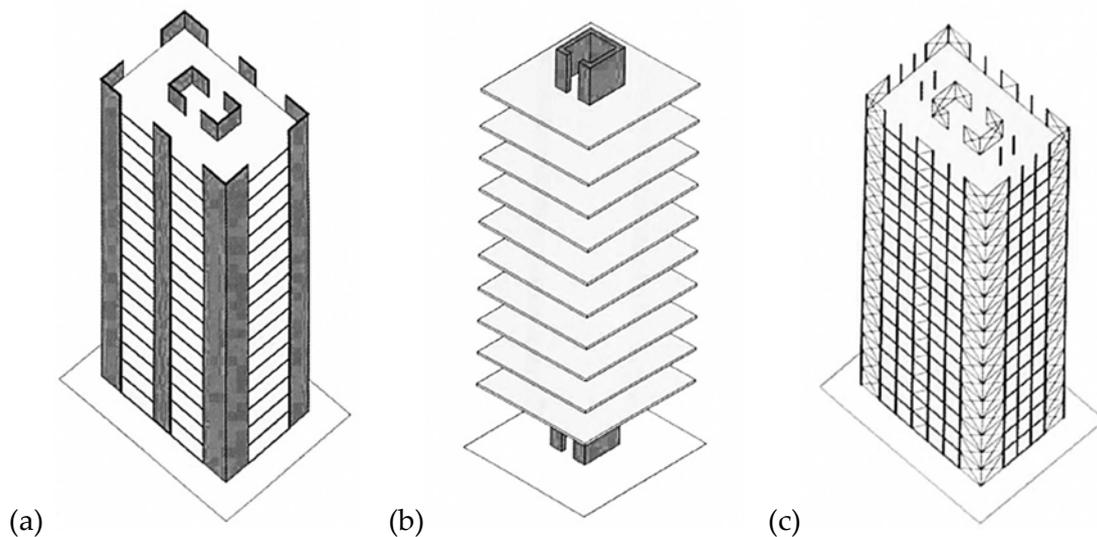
Shear wall system (a), core system (b) and shear frame system (c)<sup>46</sup>
